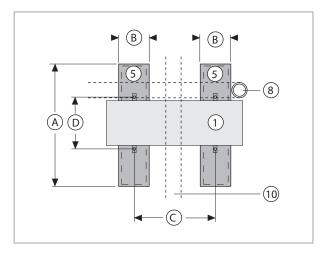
Dimensions for the strip foundation (bird's eye view)
